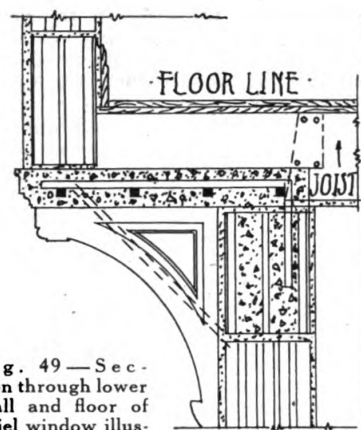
Section through lower wall and floor of oriel window illustrated in Fig. 49. The weight of the window is carried on a reinforced concrete slab cast in place, which is supported by reinforced concrete brackets also cast in place.
